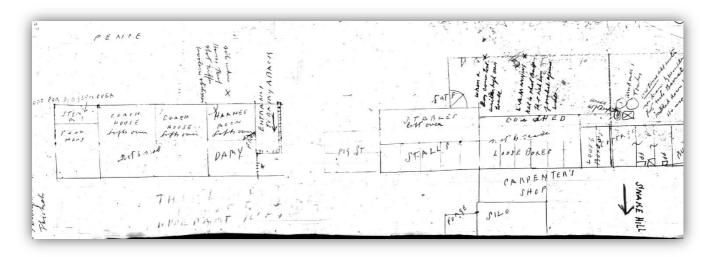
Detail of L.C. Manning's Plan showing farm buildings. Battye Library
